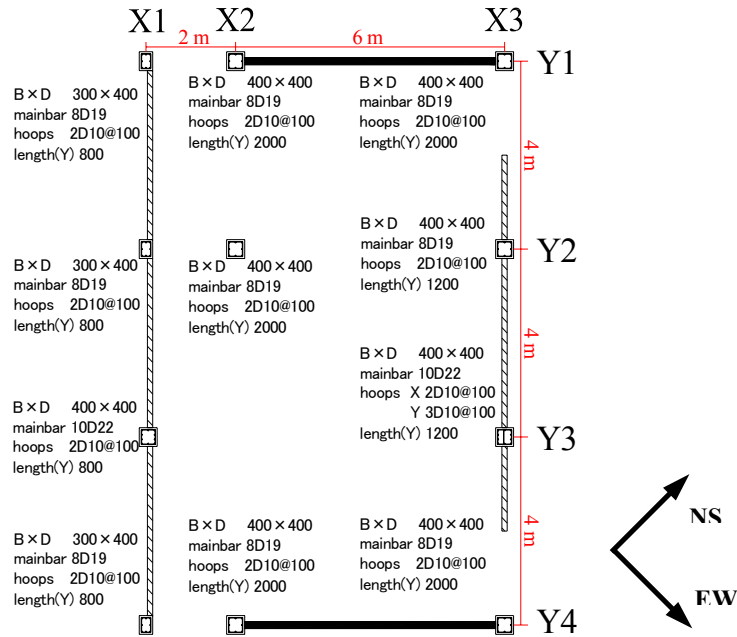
The typical floor plan of the 3rd-story full-scale test specimen
